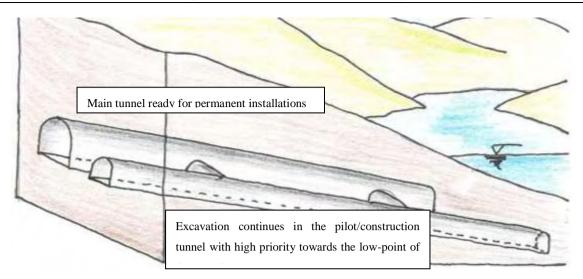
Sections of the main tunnel prepared and ready for permanent installations while excavation continue in the main and construction tunnels towards low-point
